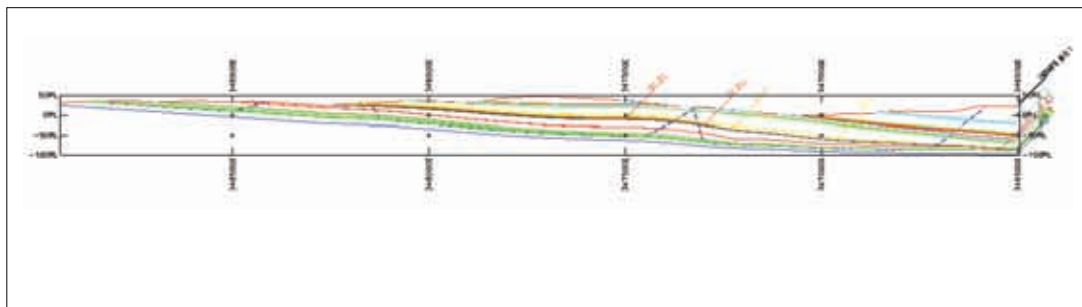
18 Final Pit Design – Sebamban North (SN Pit)
